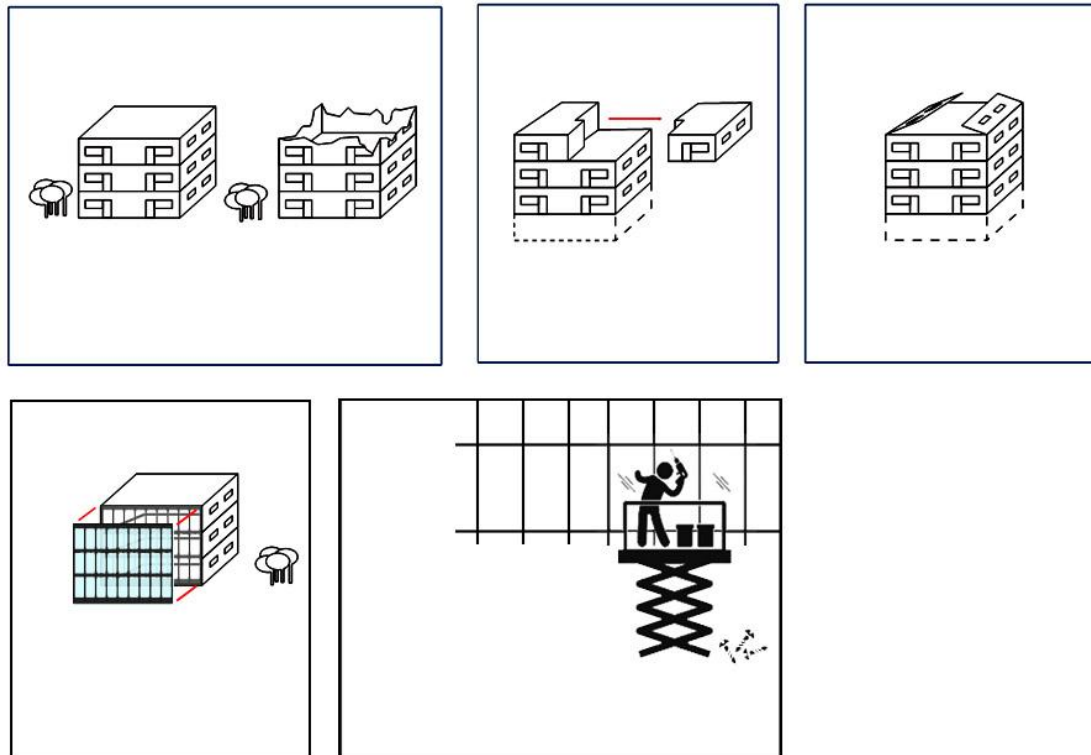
Demolition methods (a) Hydraulic crushing, Up to and including the 7th floor, (b), Diamond sawing Above the 7th floor (c) Inward folding of walls, Alternative method to ensure optimal metal collection, (d) Striping, not demolished in their entirety, and (e) Disassembly, dismantle building components intact (source of the first three diagrams: ((EAA), 2004))
